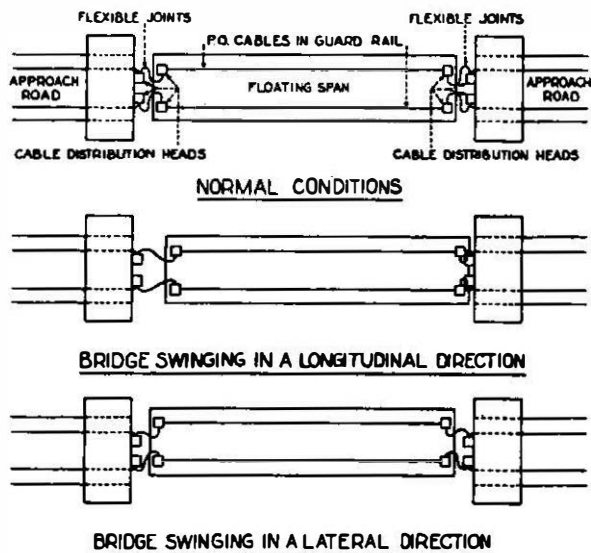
MENAI BRIDGE CARLING ARRANGEMENTS.
